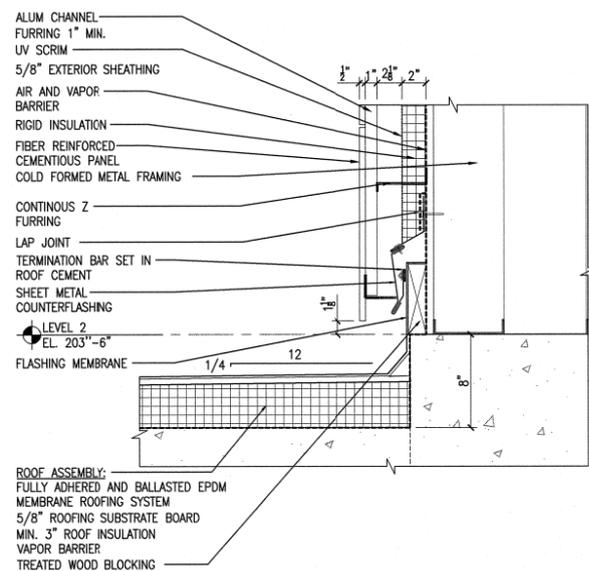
Construction Detail of FRCP Rain Screen Panel at the Slab Edge
